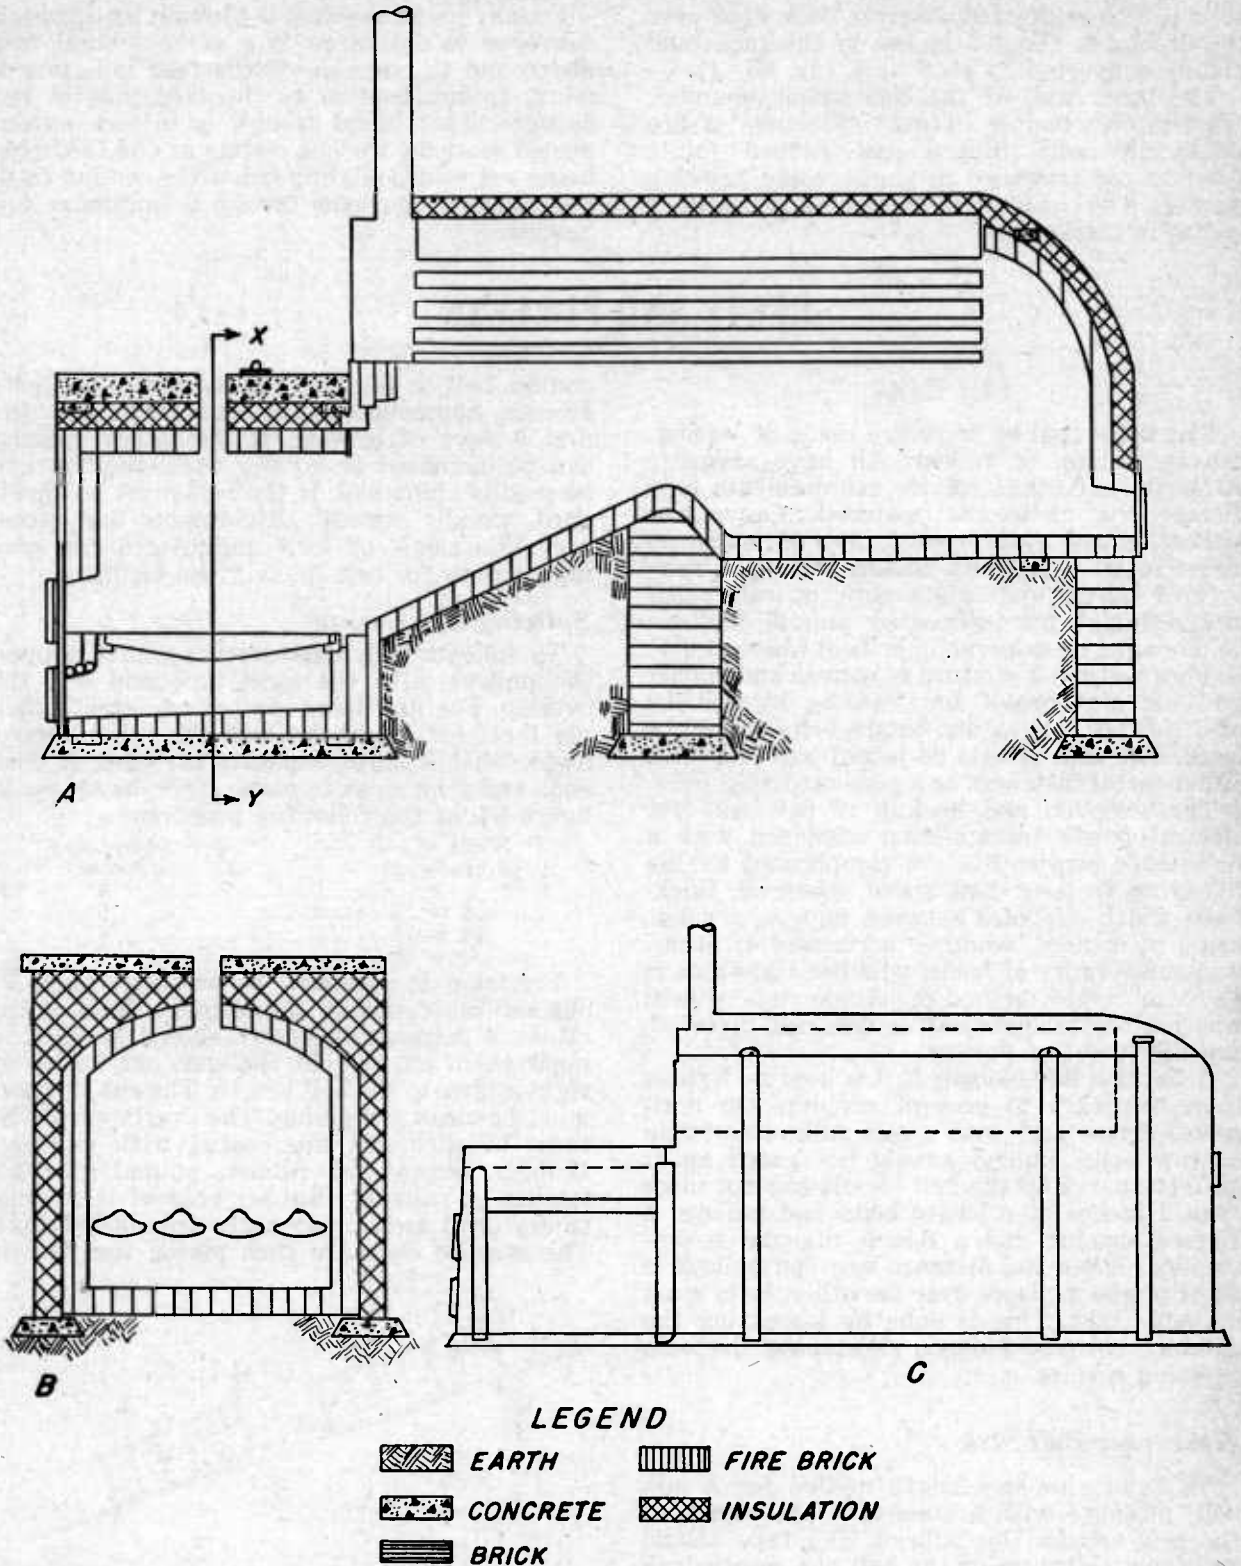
Dutch oven. A, Side elevation. B, Section through $x-y$. C, Side elevation showing placement of steel strapping over insulation.
